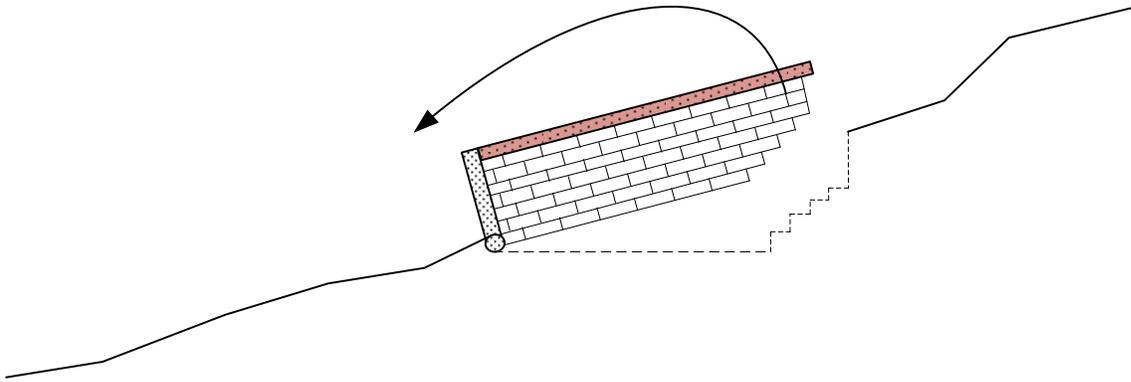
External seismic stability failure involving overturning of an entire vertical embankment about the toe of the embankment.
